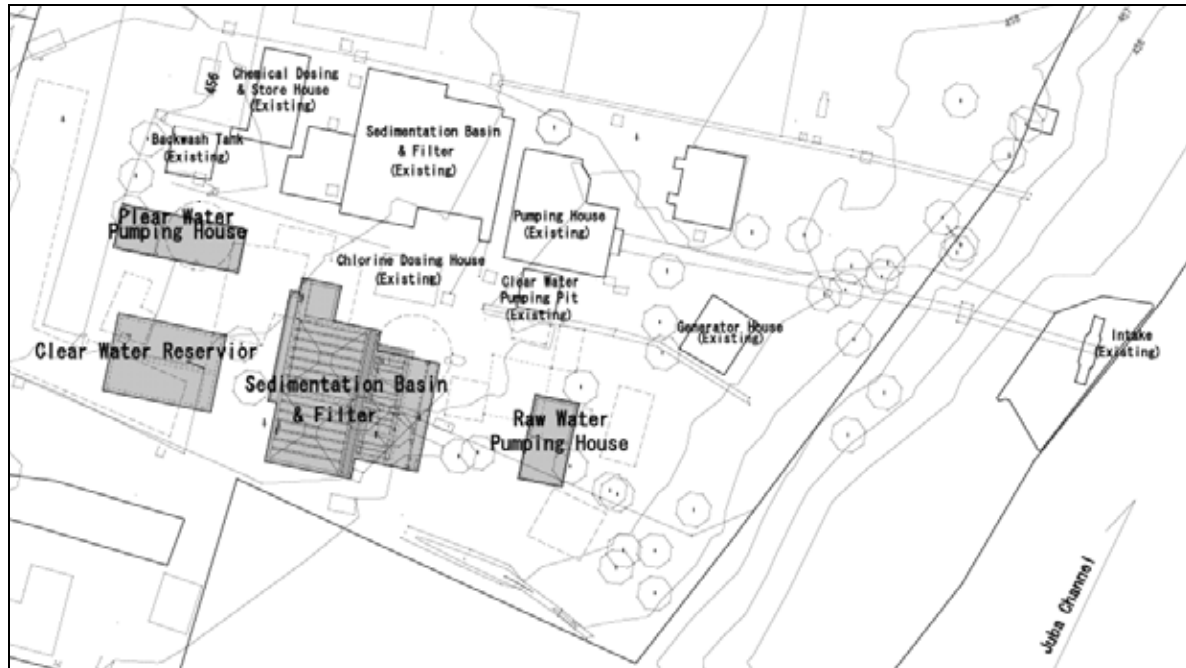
General Layout of Expansion Facilities in Existing WTP
